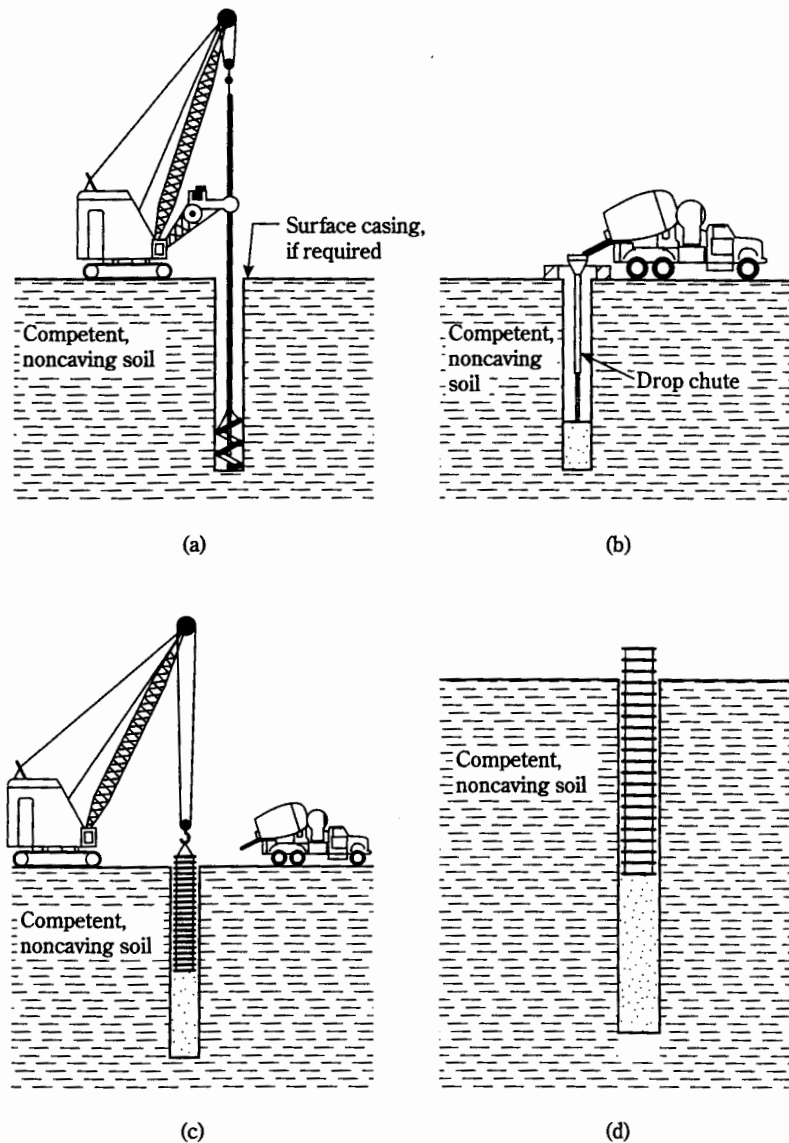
Dry method of construction: (a) initiating drilling; (b) starting concrete pour; (c) placing rebar cage; (d) completed shaft (after O'Neill and Reese, 1999)
